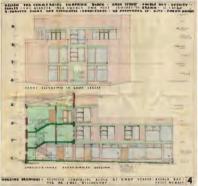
Evan's Knox Street elevation and section of the proposed "shopping block" at No 21 Bay Street.
